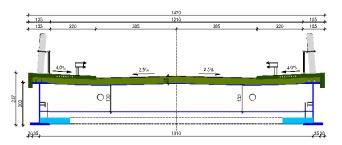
Steel/reinforced concrete composite cross section of the bridge
